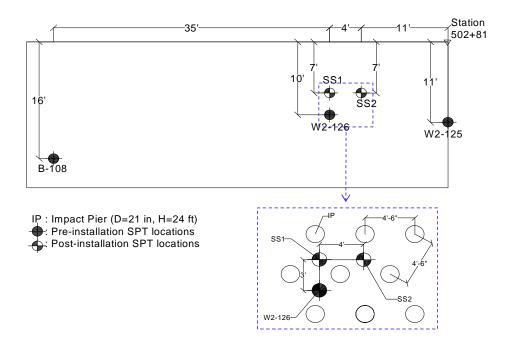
Rochester, NH: Piers and SPTs locations plan layout
